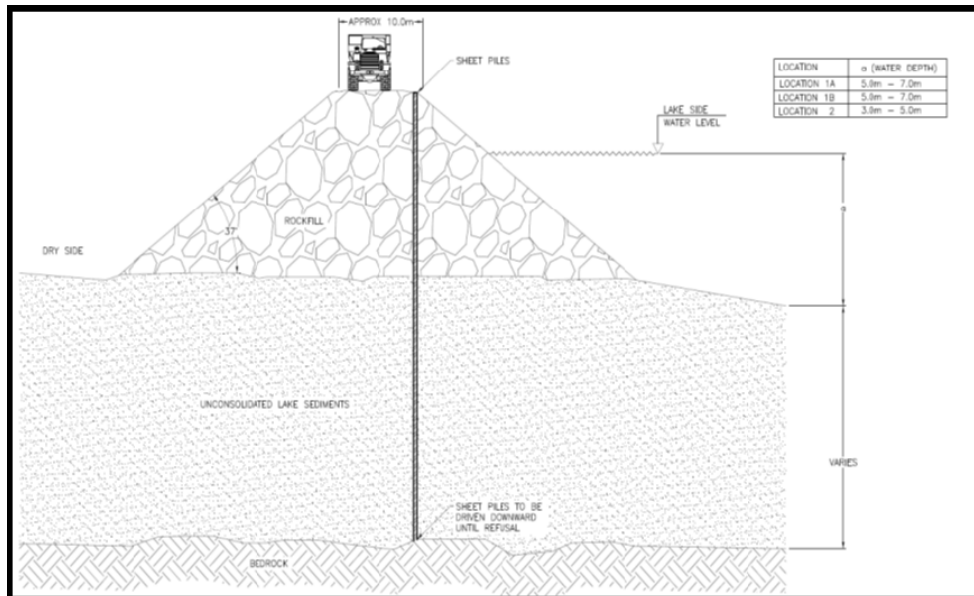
Section - Single Wall Sheet-Pile Dike
